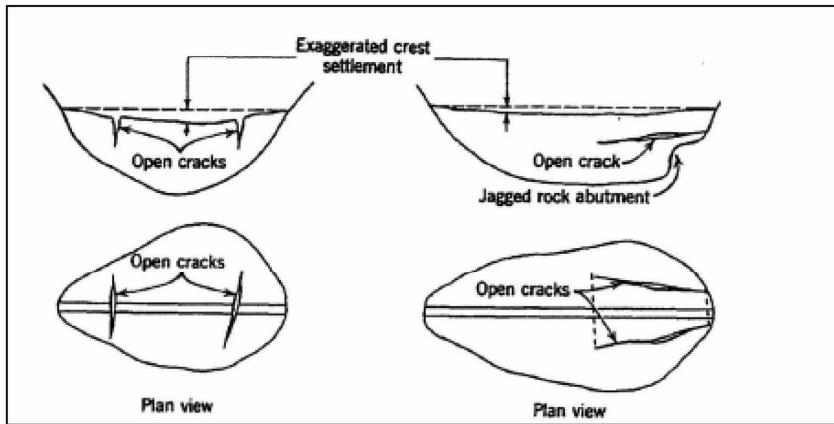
Settlement-induced cracks that can initiate internal erosion
